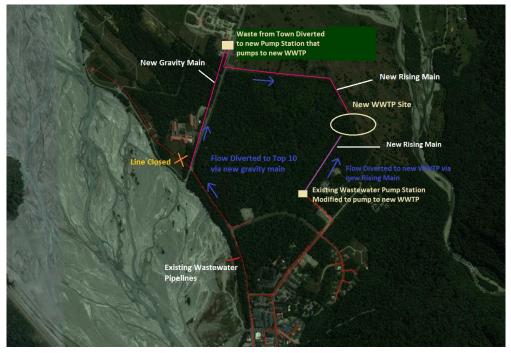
New Wastewater Mains and Pump Station with Modified Existing Pump Station for Sites 1, 2 and 3
